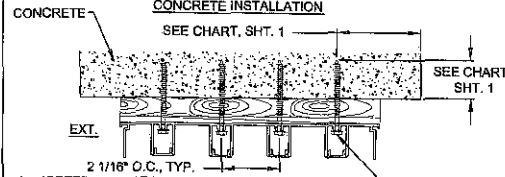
TRACK FRAME SILL CONCRETE INSTALLATION
